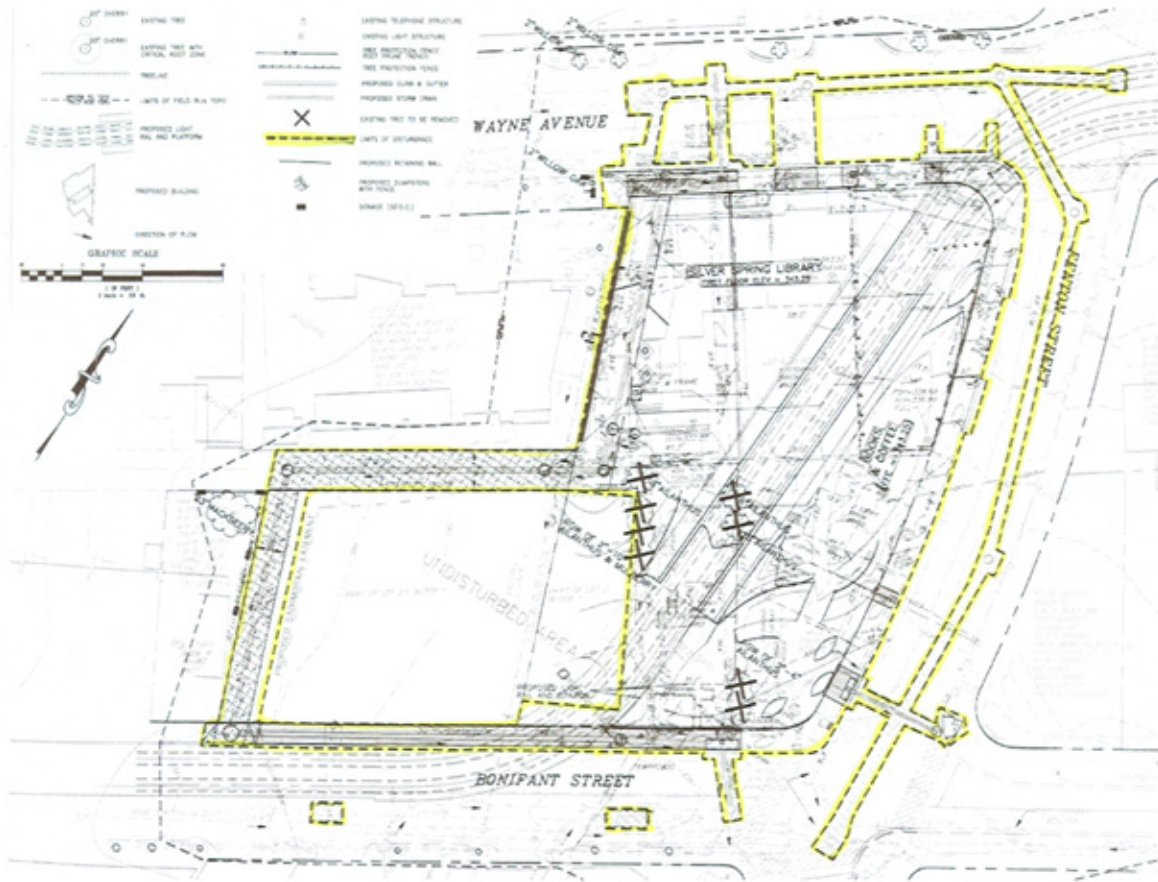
Exhibit A – Silver Spring Library and Arts Center PFCP (sheet 1 of 2)
